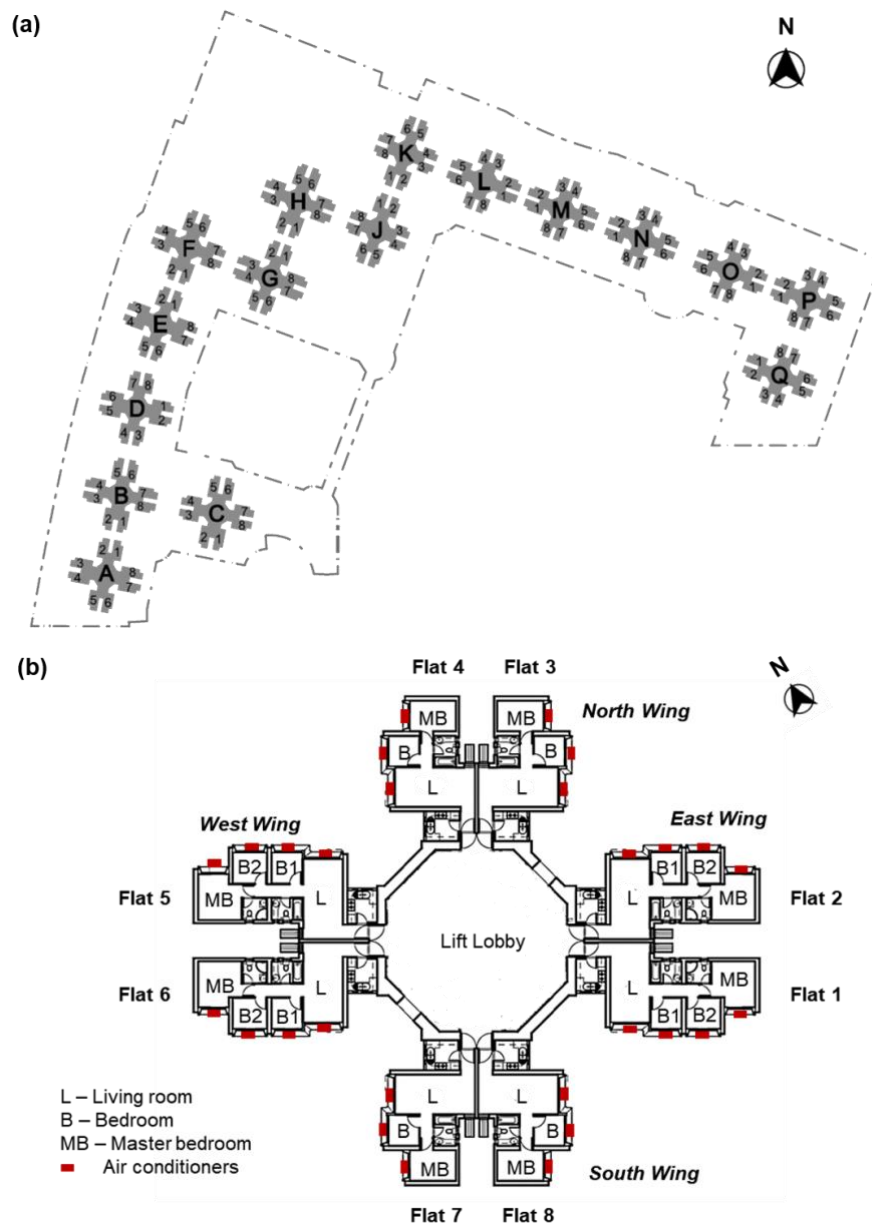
a) Block layout of a typical public housing estate in Hong Kong (16 blocks; 40 floors per block); b) typical floor plan (8 flats per floor; standard block type: Concord-1).
